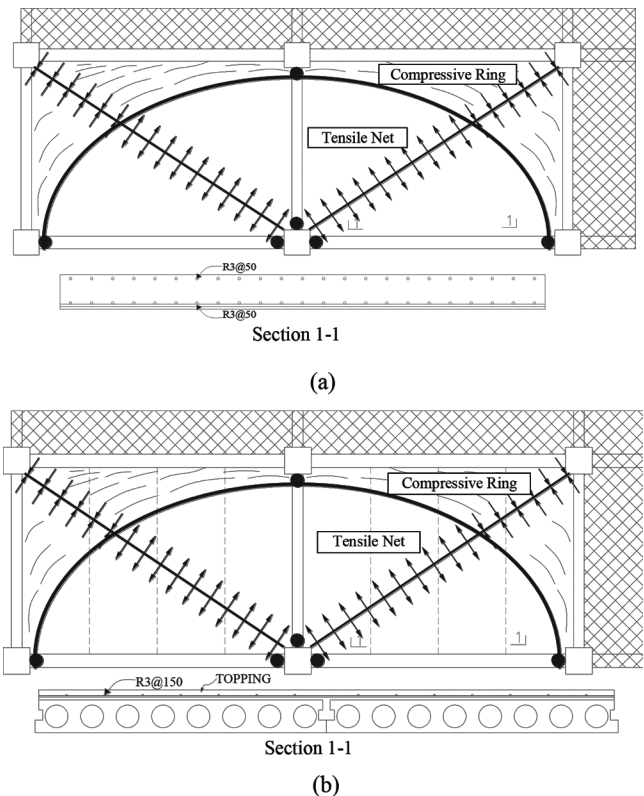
Internal force in panels of test specimens: (a) RC1; and (b) PC1.
